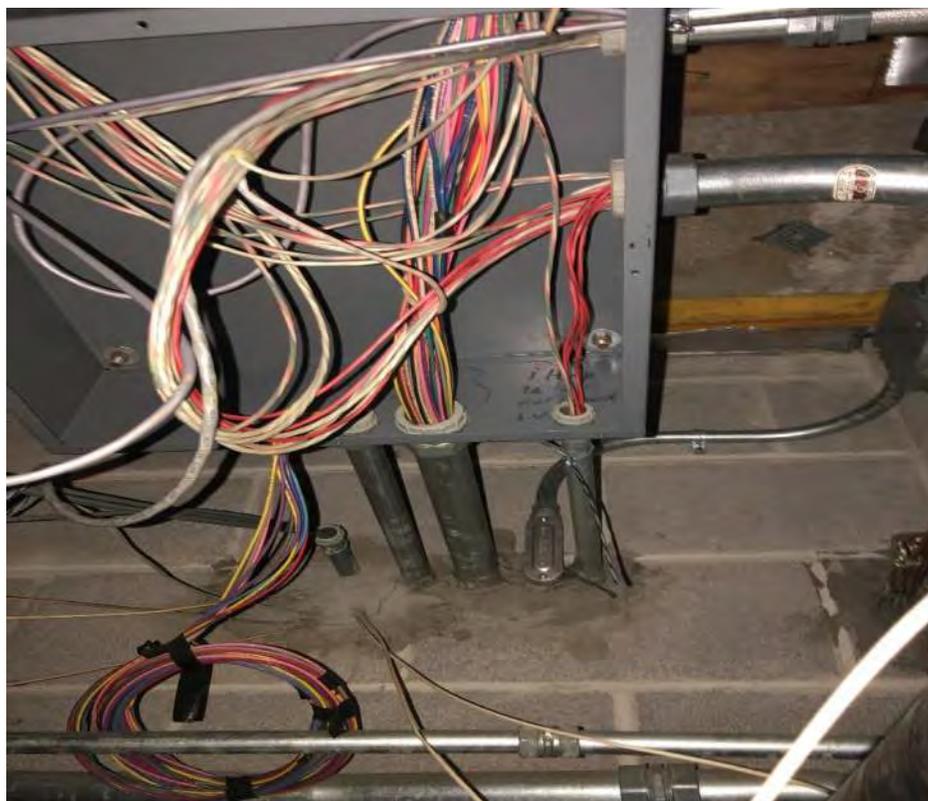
View of the non-suspect wires in the electrical box in basement room B-7. Photo taken December 23, 2020.
